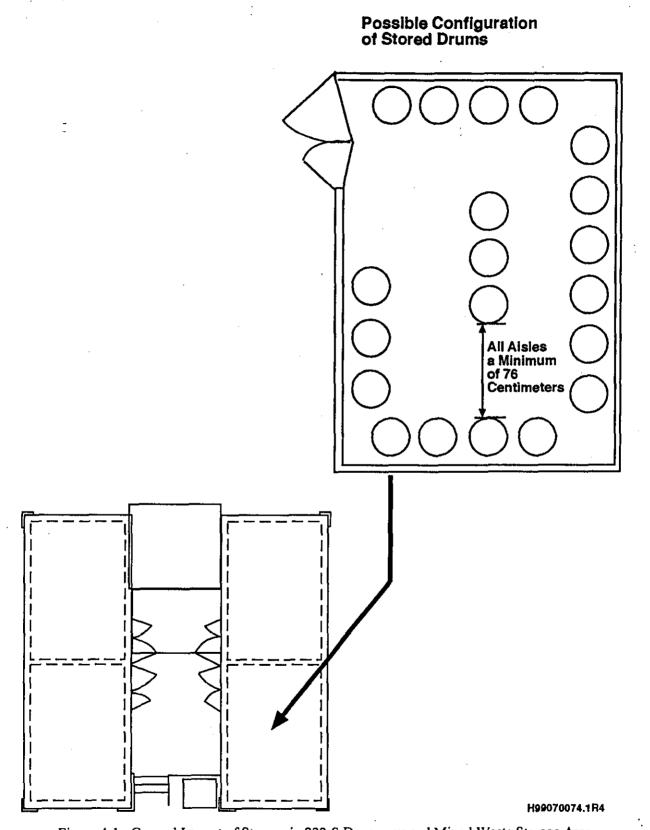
General Layout of Storage in 222-S Dangerous and Mixed Waste Storage Area.
